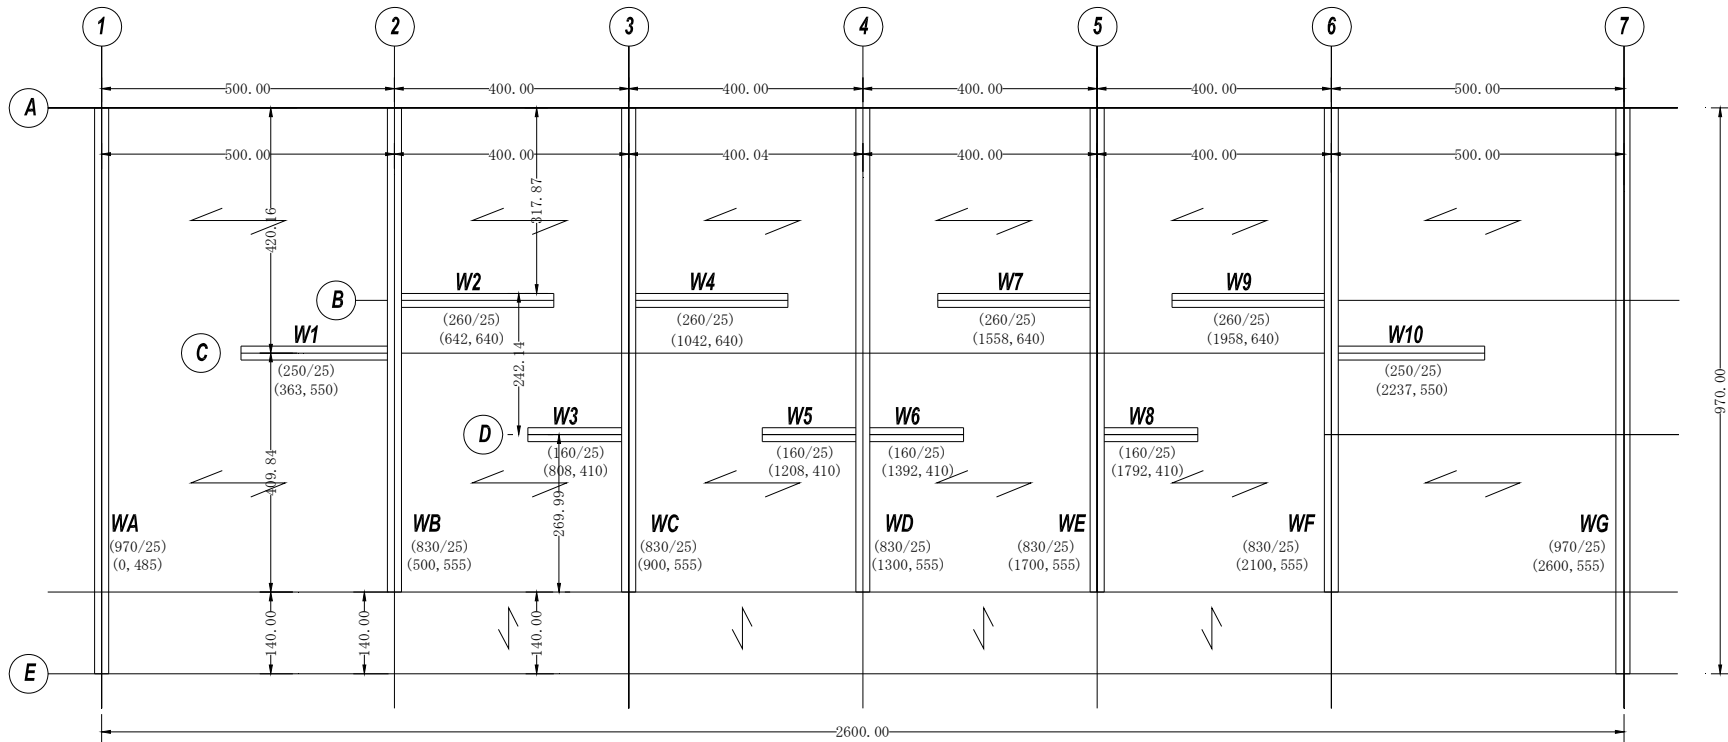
Reinforced Masonry Wall Building Typical floor Plan
